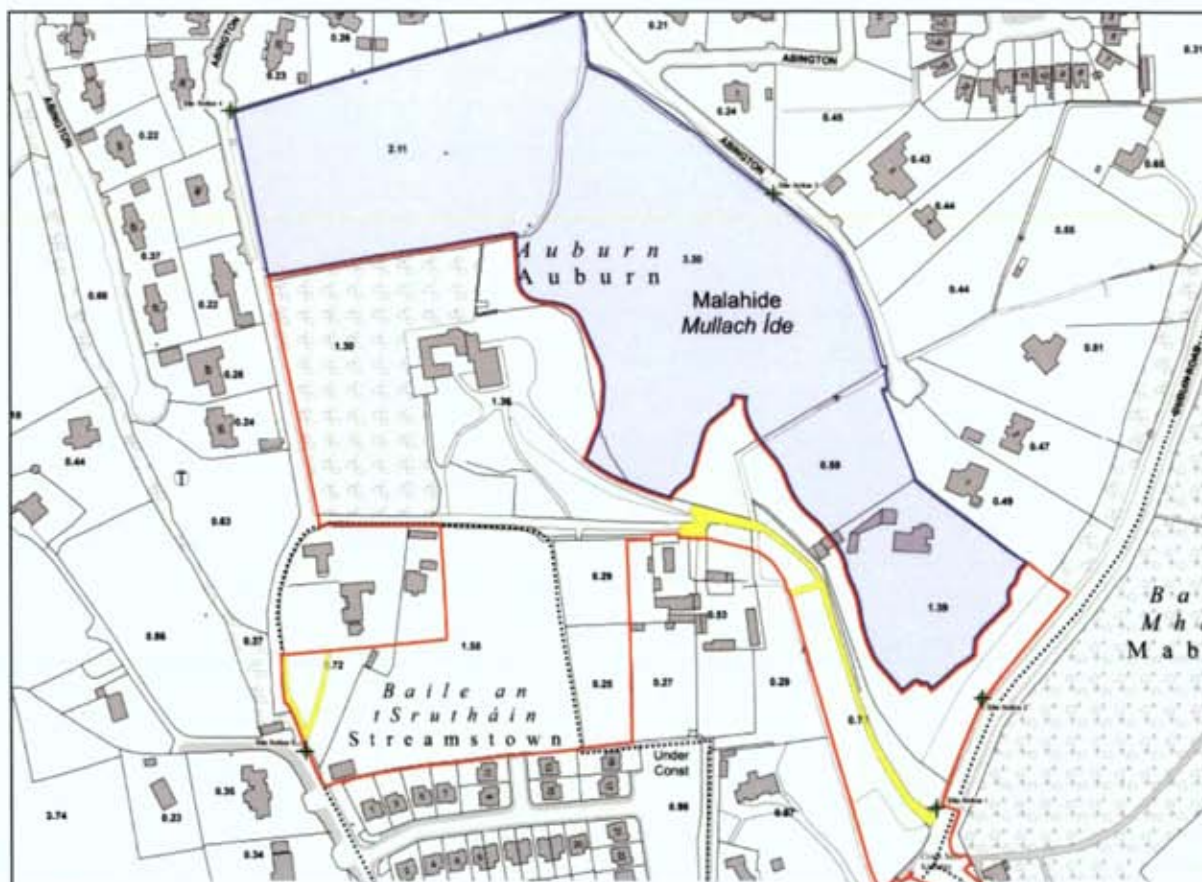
Outline of Site Boundary, excluding underground rising main along Back Road and Kinsealy Lane (source: CCK Architects)
